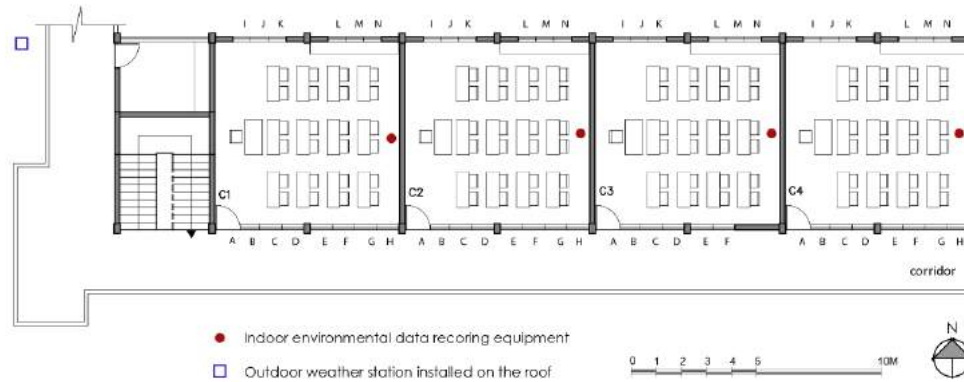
Layout plans of a characteristic secondary school classroom in Cyprus. Openings are marked from A to N, and the recording equipment used to monitor the indoor and outdoor environmental conditions are indicated in red.
